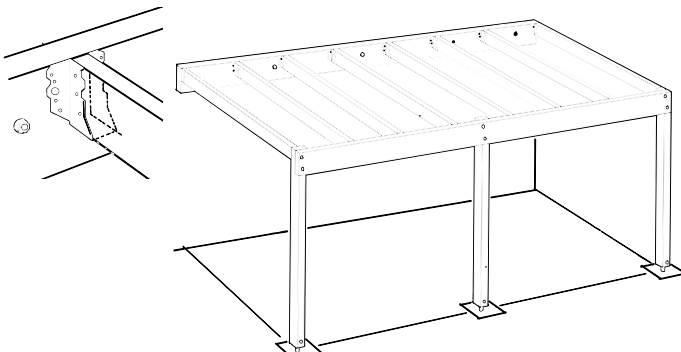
Fix rafters to bearers with joist hangers and galvanised nails.
